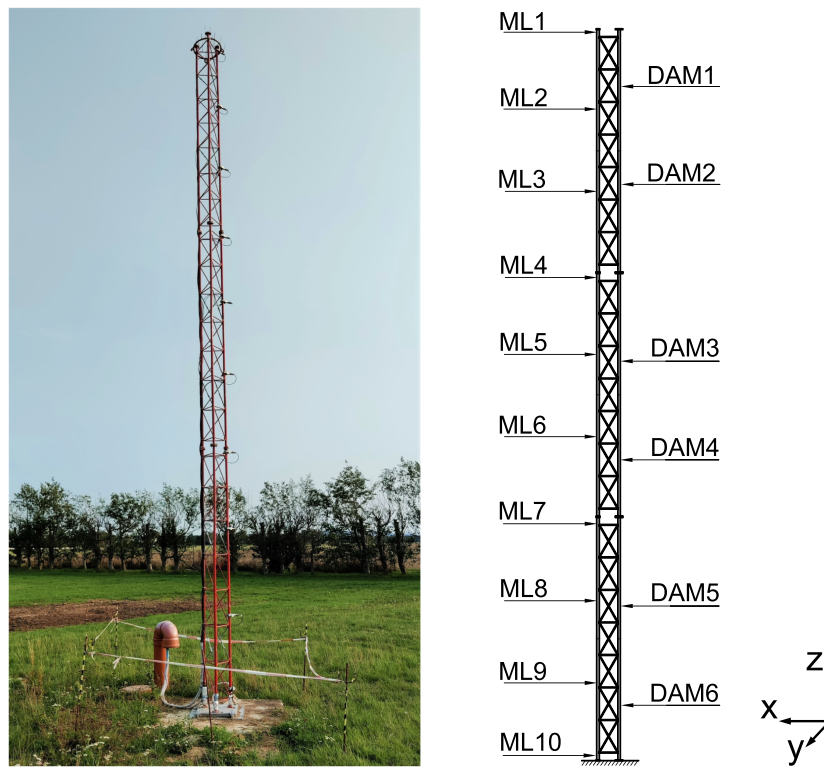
Photograph of the test structure (left), and schematic drawing including the measurement levels (MLs) and the damage locations (DAM) (right)
